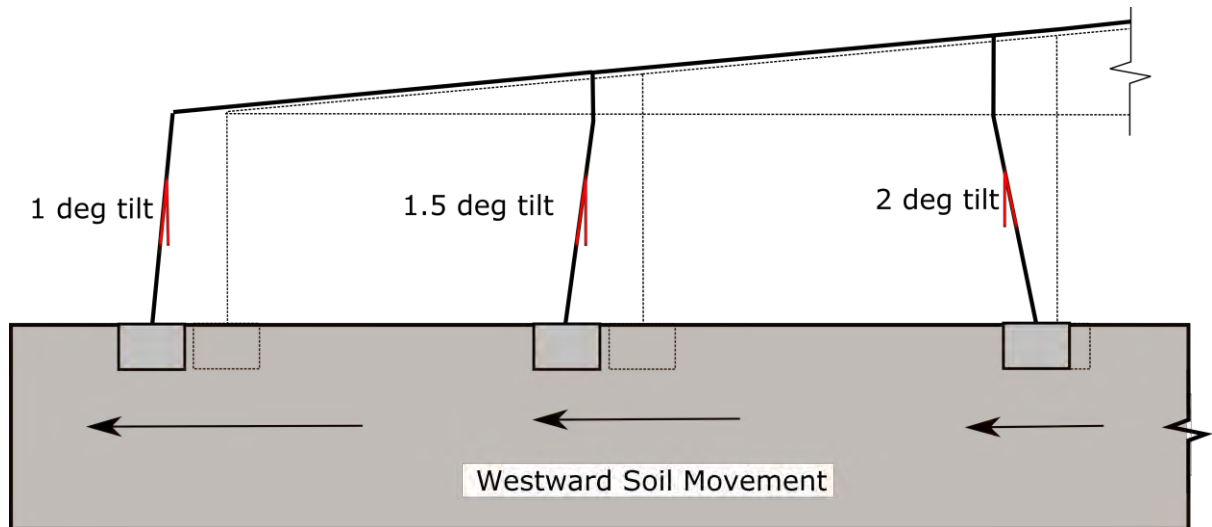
Schematic of deformation pattern of steel frame along the north wall of CS building (3 west-most columns of the Shed; looking north from interior).
